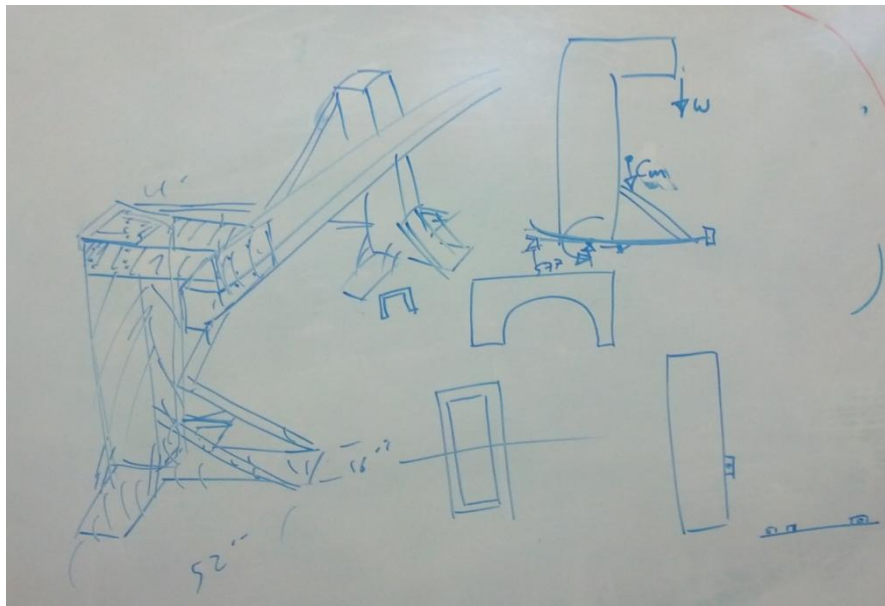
White Board Sketch of Elevated Guide Way Initial Design (Wicklow, 2014).
